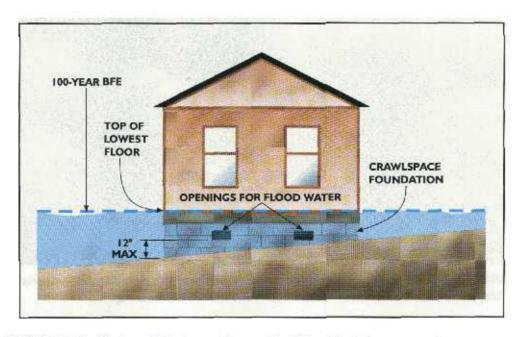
The top of the lowest floors of buildings in A-Zones must be at or above the BFE. Foundation walls below the BFE must be equipped with openings that allow the entry of flood waters so that interior and exterior hydrostatic pressures can equalize.
